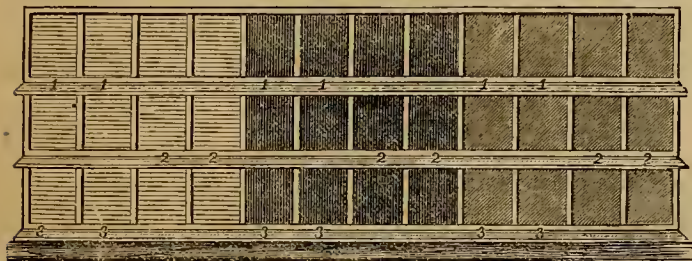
PLAN OF HOUSE FOR SITTERS.
